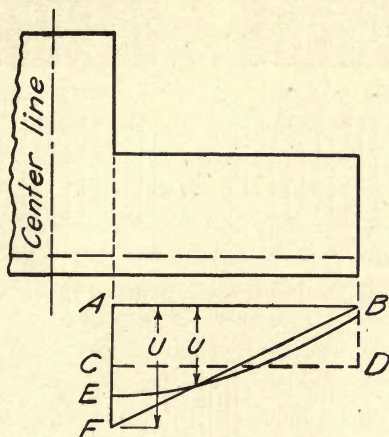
DISTRIBUTION OF BOND STRESS ALONG THE REINFORCEMENT IN A WALL FOOTING.
